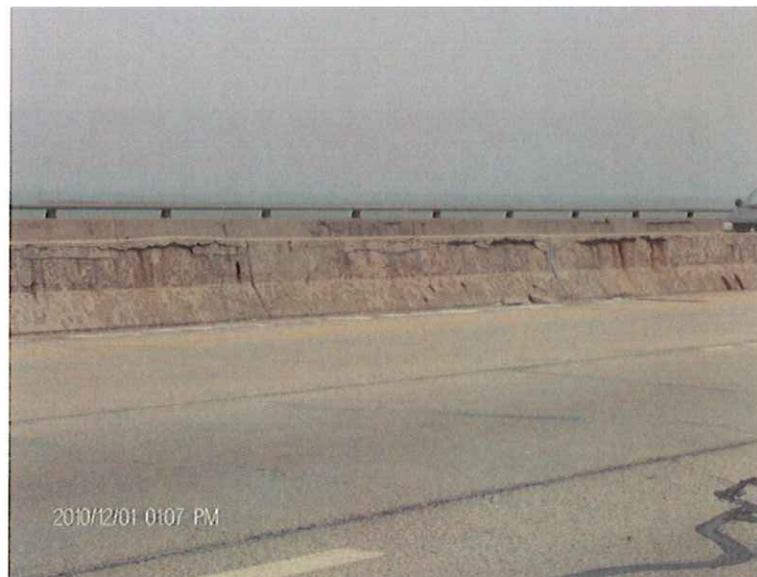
Parapet - typical horizontal cracks and delaminations on the median parapet
